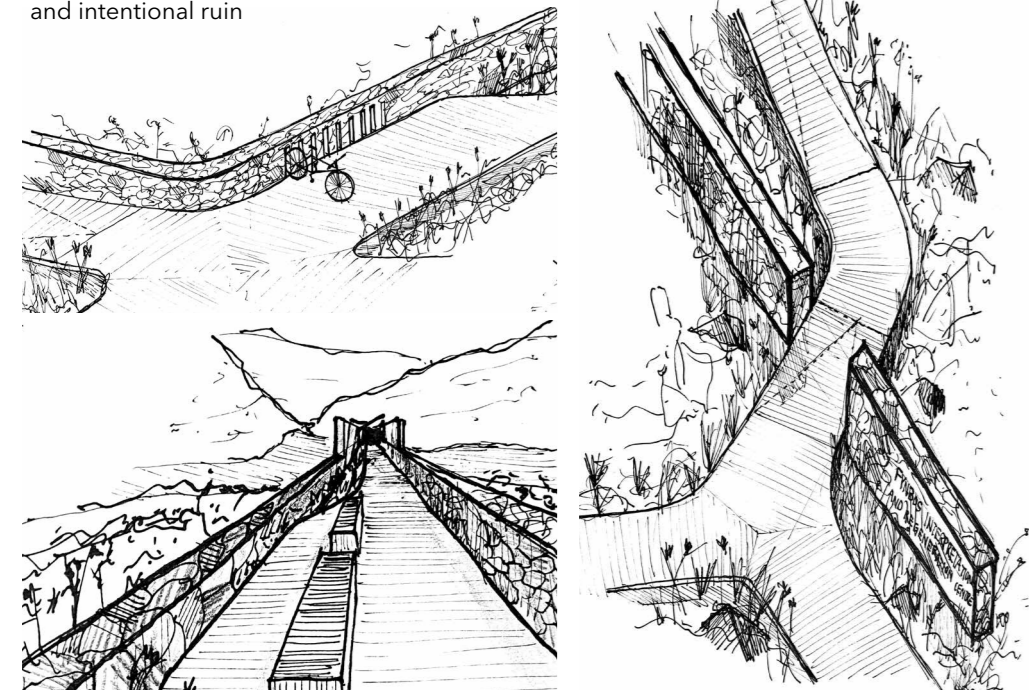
Isometric render of walkway-trail transition (Author,2021).
